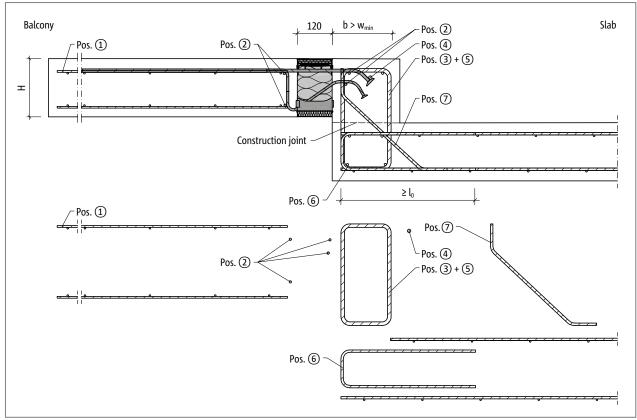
Schöck Isokorb® XT type K-O: On-site reinforcement for balcony with height offset upwards with larger structural element dimension (w_{vorh} > w_{min})
